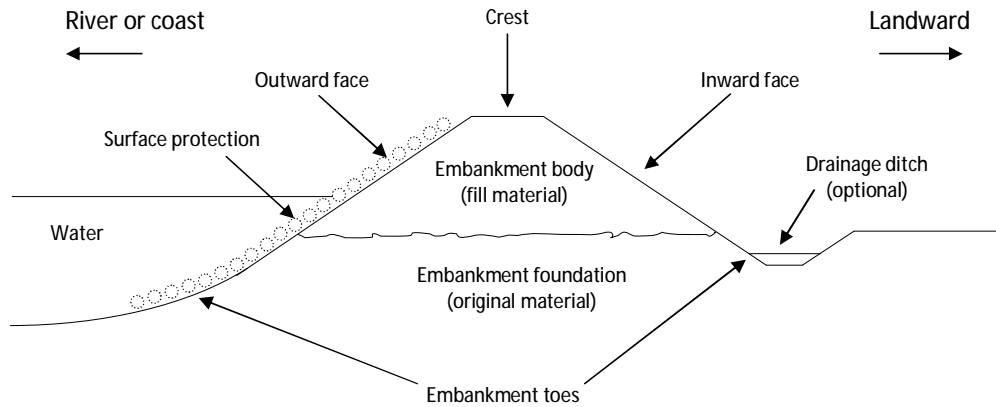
Typical cross-section of a flood embankment (after Dyer, 2004)
